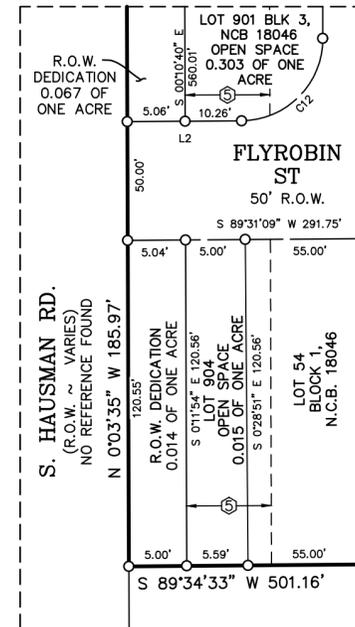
DETAIL "B" NOT TO SCALE SEE SHEET 2 OF 3
